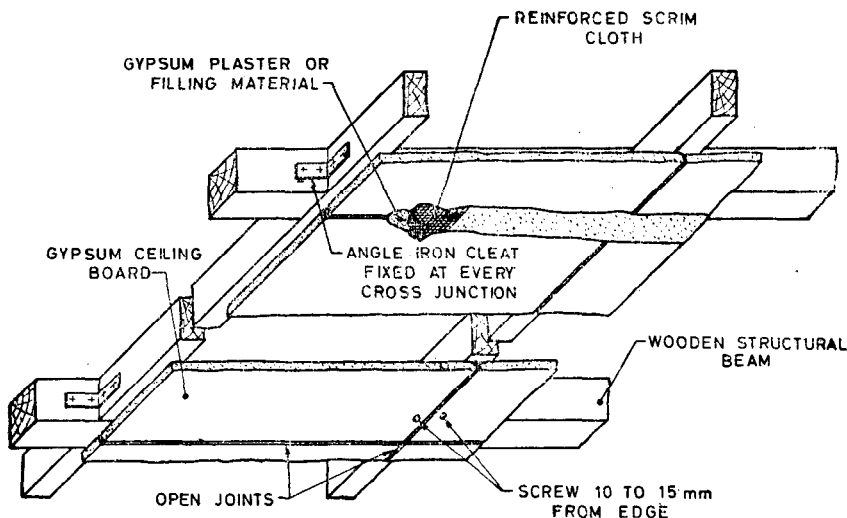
FINISHING TREATMENT FOR JOINTS IN GYPSUM BOARD CEILING
